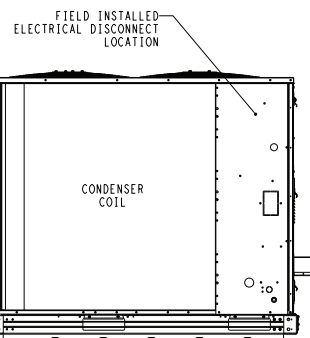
Unit Dimensional Drawing, 48WE*H07, Single-Zone Electric Cooling with Gas Heat (cont)
